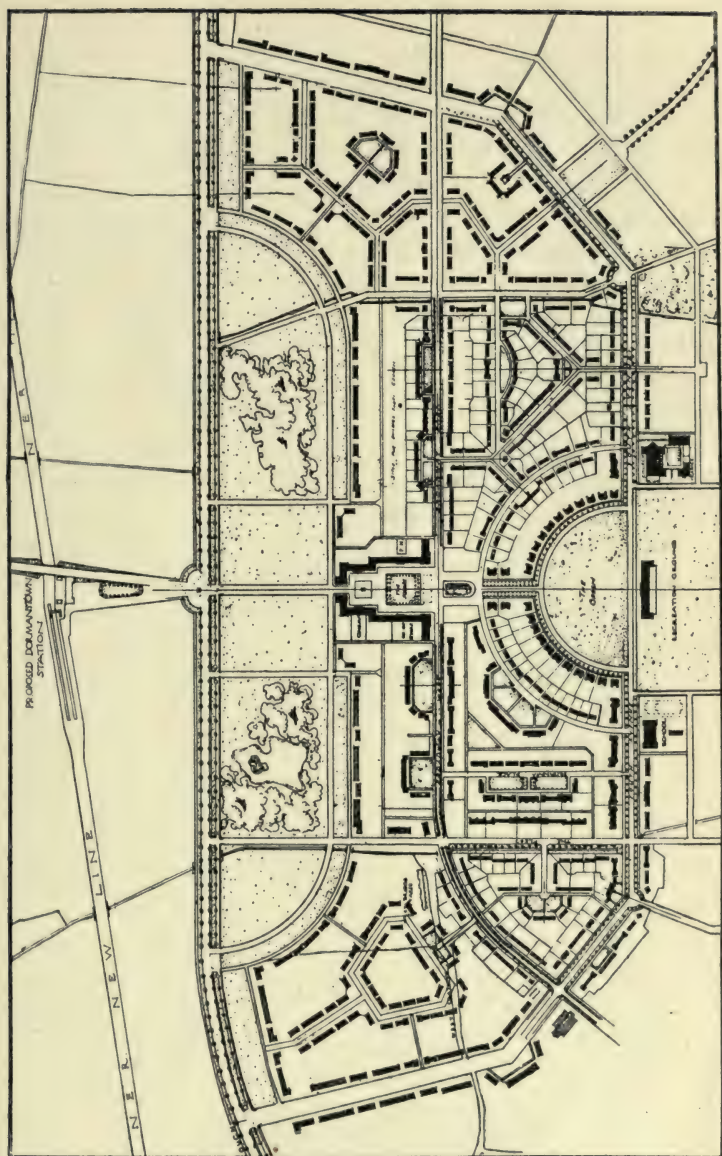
Lay-out plan of Dormanstown near Redcar.
